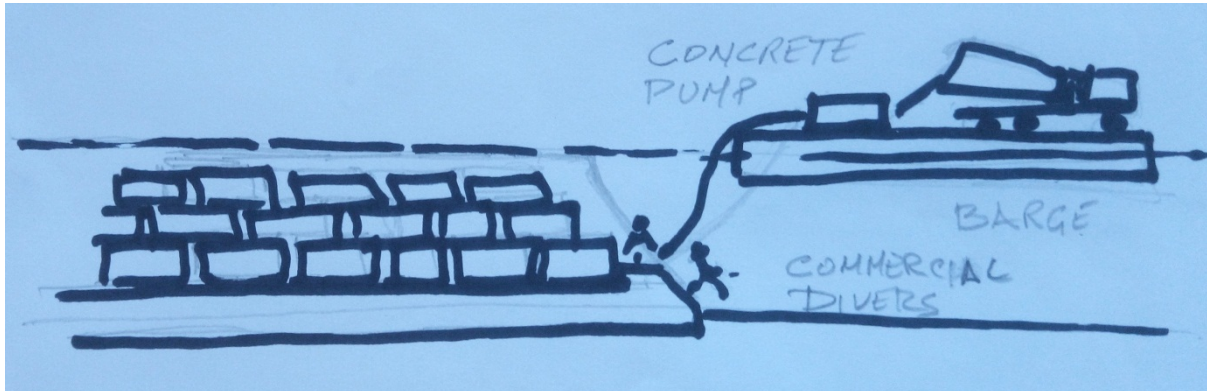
Sketch showing the reinforcement of the structure with concrete.
